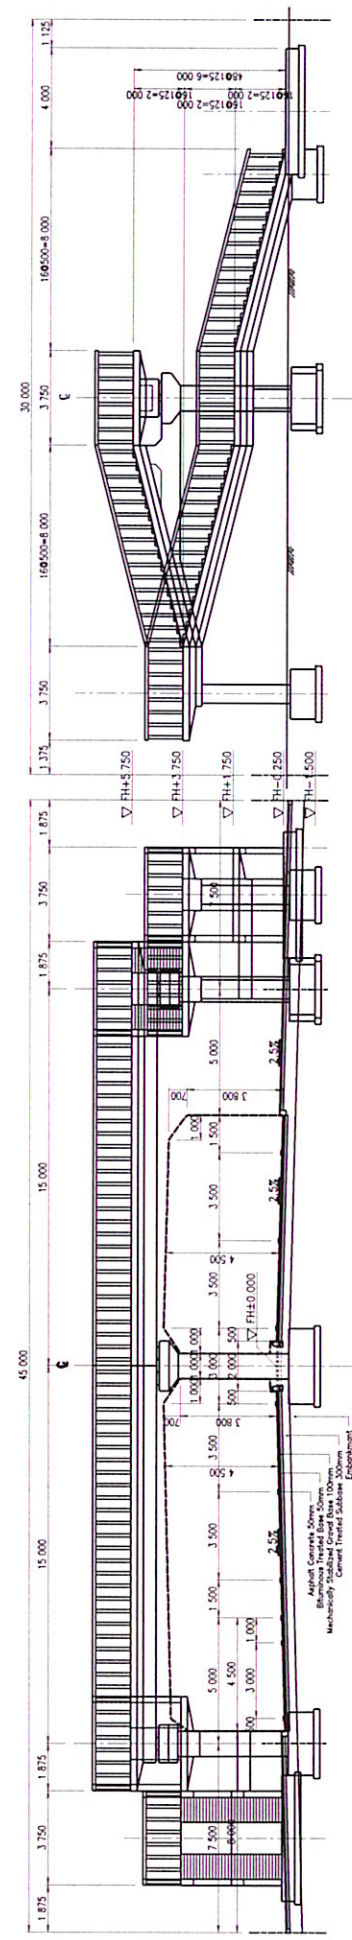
shows a conceptual layout of pedestrian bridge.
